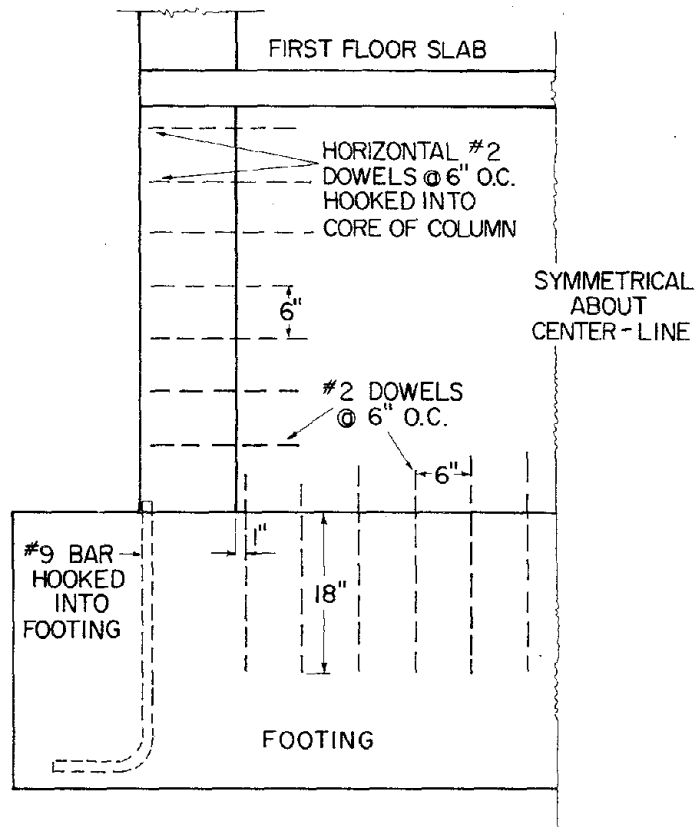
DOWELS ORIGINALLY PLACED AT FIRST-STORY LEVEL TO FACILITATE STRENGTHENING OF SPECIMEN SW7
